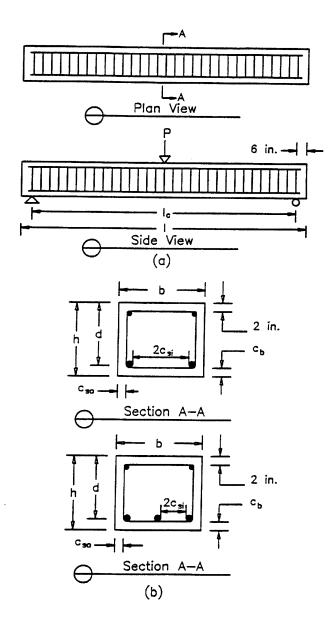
Moment-rotation test specimens: (a) as tested; (b) cross sections (1 in. = 25.4 mm)
